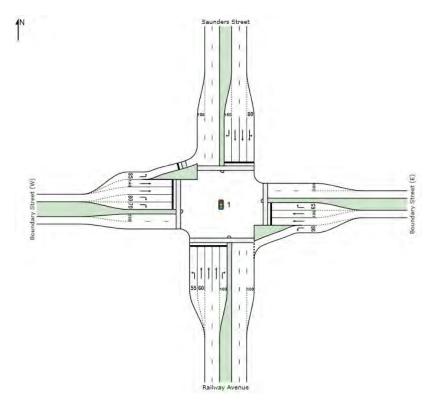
Proposed layout for the intersection of Railway Avenue, Boundary Street and Saunders Street with development traffic in year 2023
